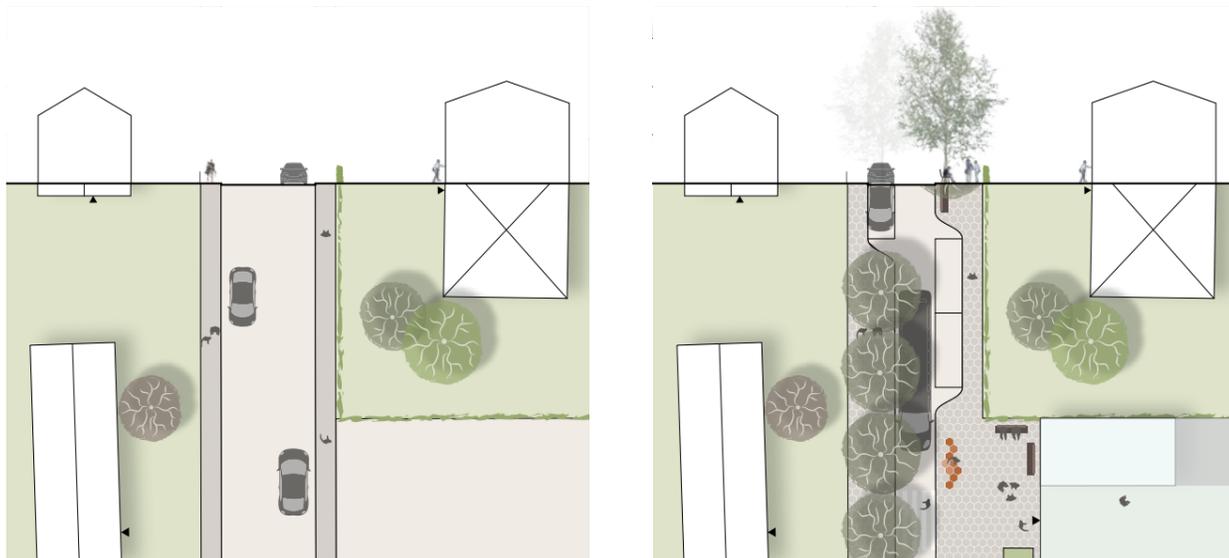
Adjustments to the road layout, while staying within existing boundaries.
